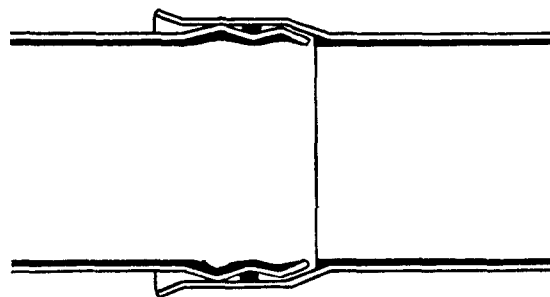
Stab-type joint for steel pressure-sewer pipe.
